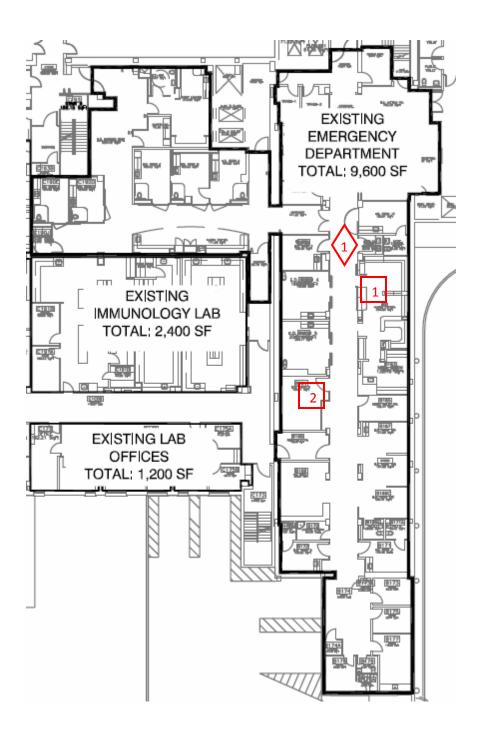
Main ED Floor Plan and Measurement Locations for Hospital 2
